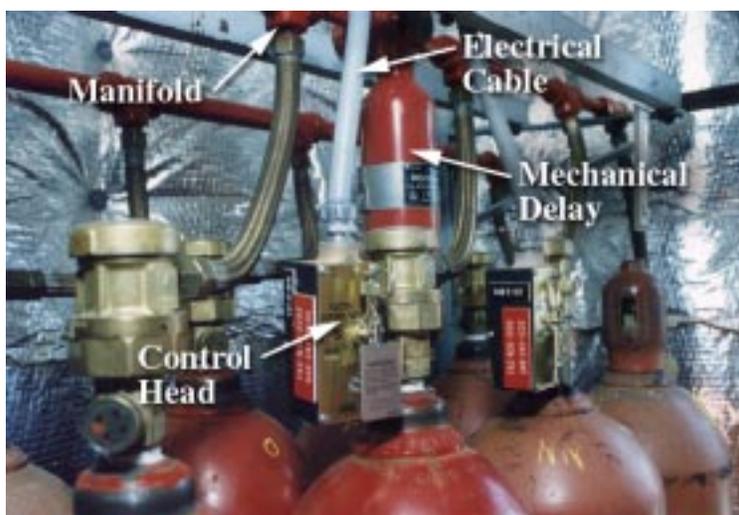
Control Head and Mechanical Delay Mechanism
